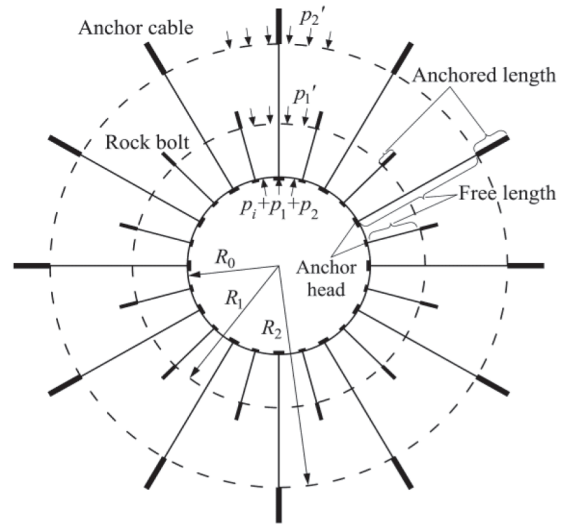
Circular tunnel reinforced by systematic pretensioned rock bolts and anchor cables.
